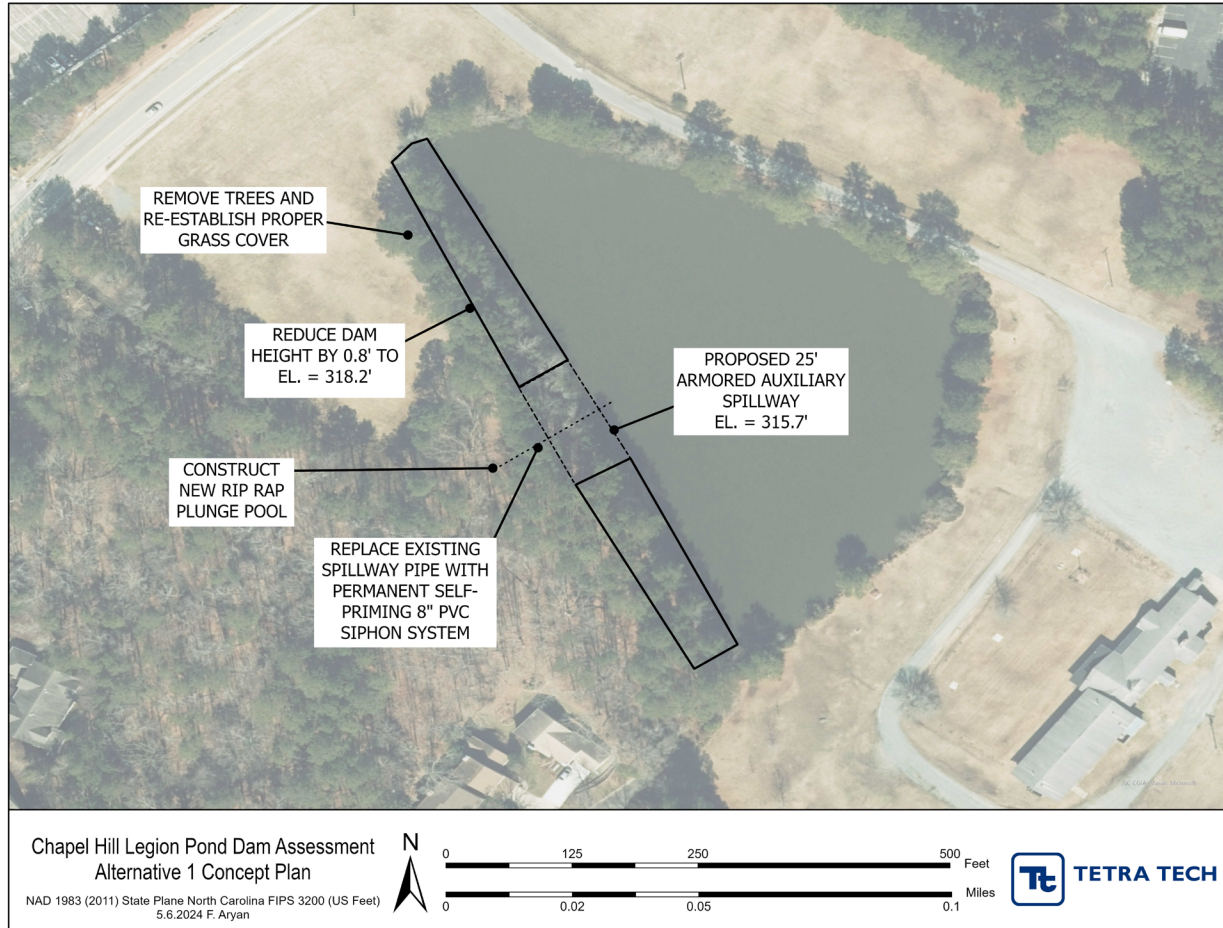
Option 1B: Lower Dam and Resize Pond – Dam and Spillway Concept Plan.
